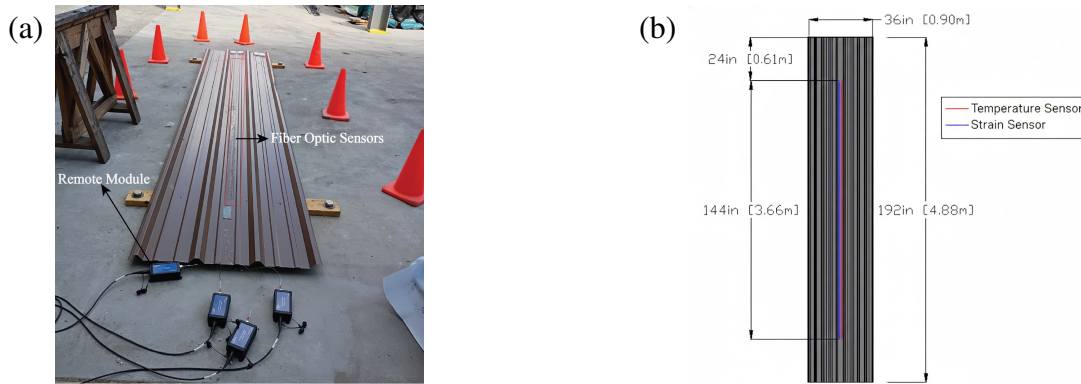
Instrumentation and panel details: (a) Test setup; (b) deck configurations, including fiber optic cable layout diagram.
